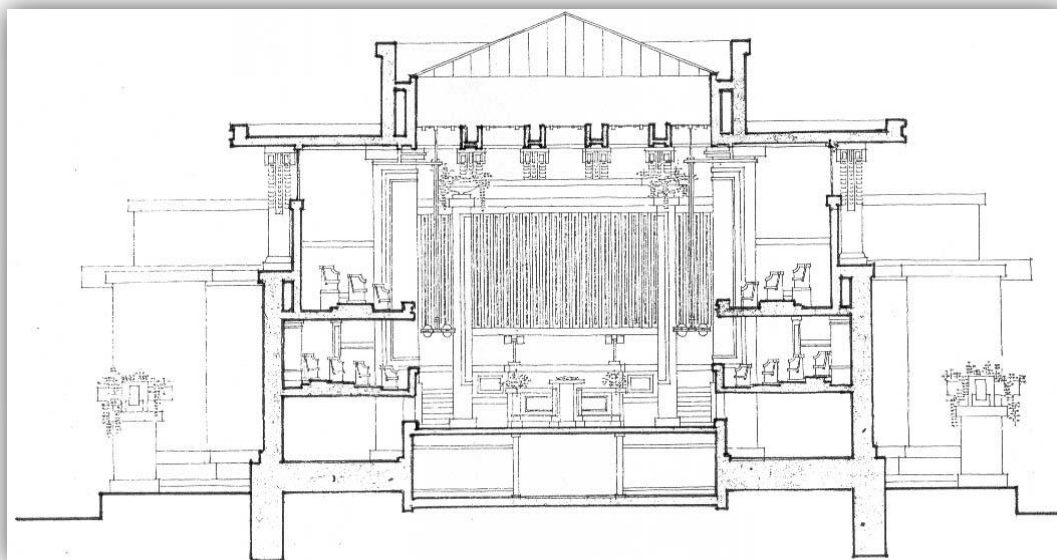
Cross section of the Temple showing the concrete roof slab and the overhang (Source: solopassion.com)
